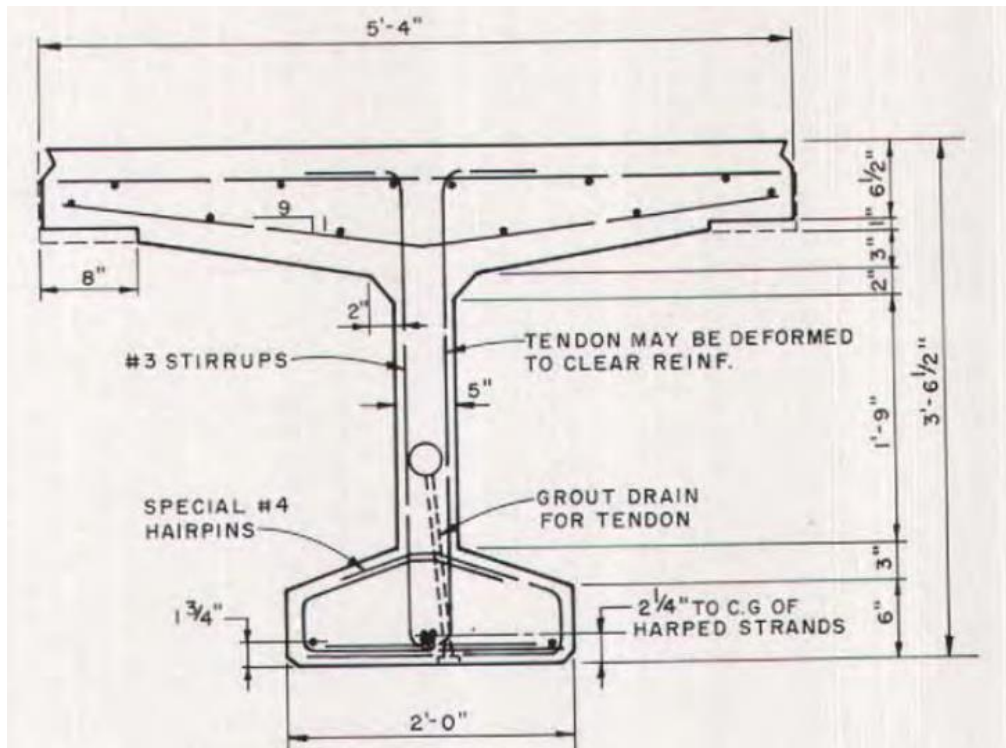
Cross section of decked bulb T beam used for bridge construction (Owen 1987)
